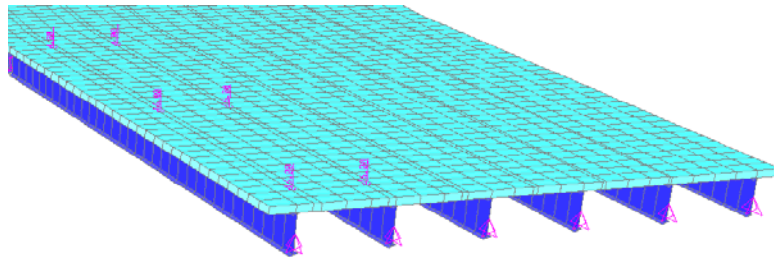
Critical transversal position for an exterior girder with one loaded lane.
